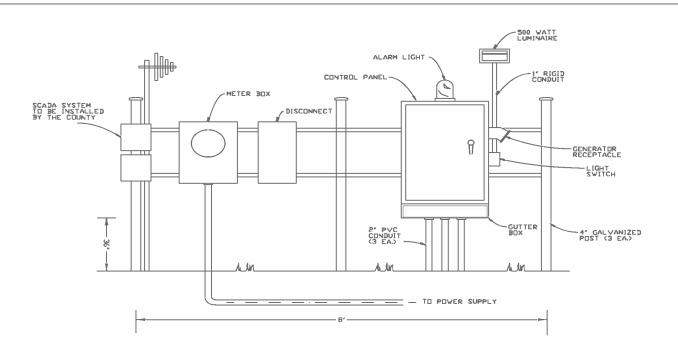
WASTEWATER PUMP STATION PLANS, SECTIONS AND NOTES
